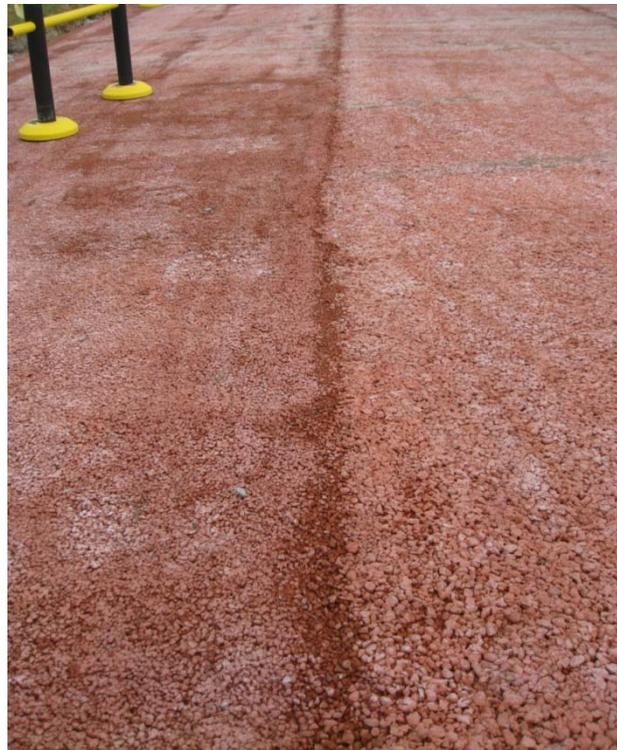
Construction Joint A/B at Site 4 November 2008 (1 Month)
